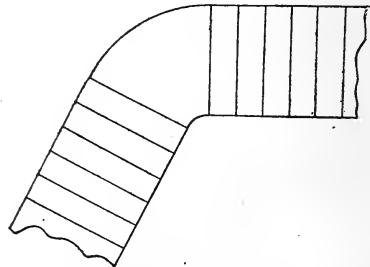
Plan of Stair with Obtuse-Angle Landing and Cylinder.
